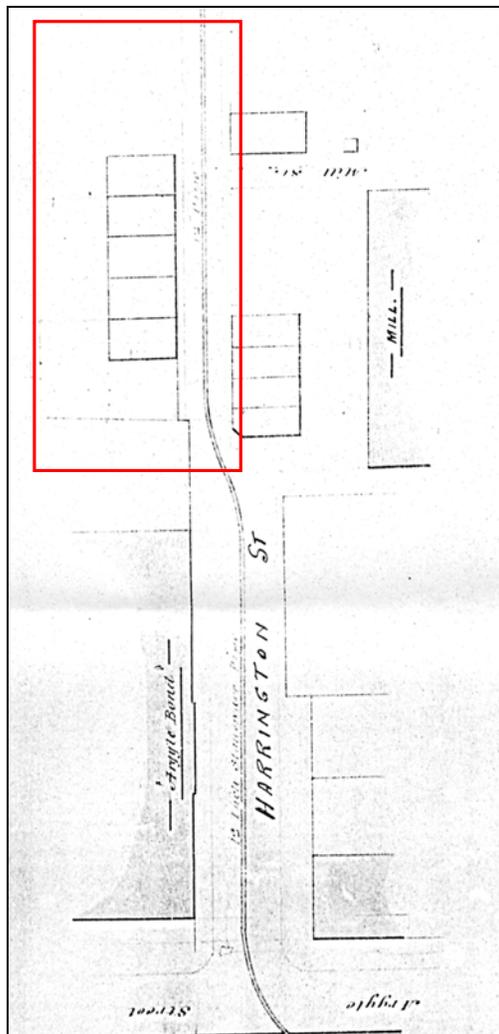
1875 sewer plan indicating the presence of five buildings on the site.
